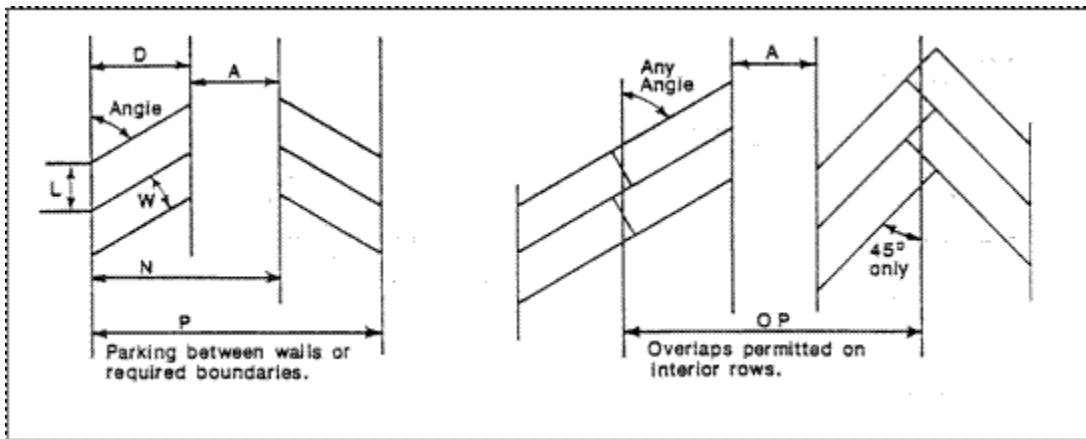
Minimum Parking Space and Aisle Dimensions
